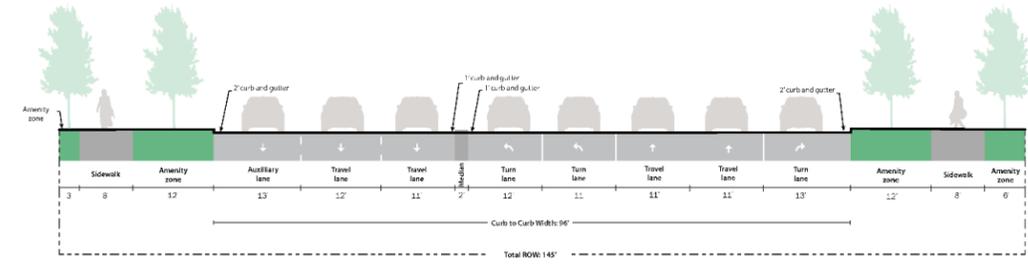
Section E (72nd Avenue West of Vrain Street – Looking East)
